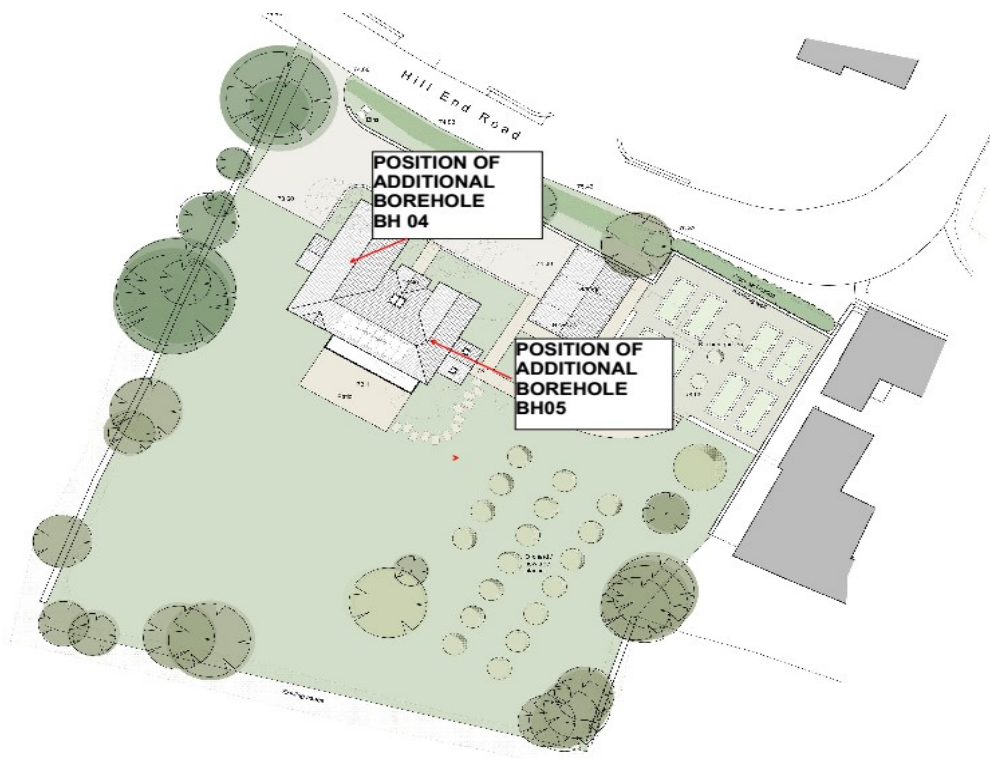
Location of Additional Boreholes – BH04 and BH05 – New Build Site in South Yorkshire: Hill End Farm, Mapplewell, S75 6DU
